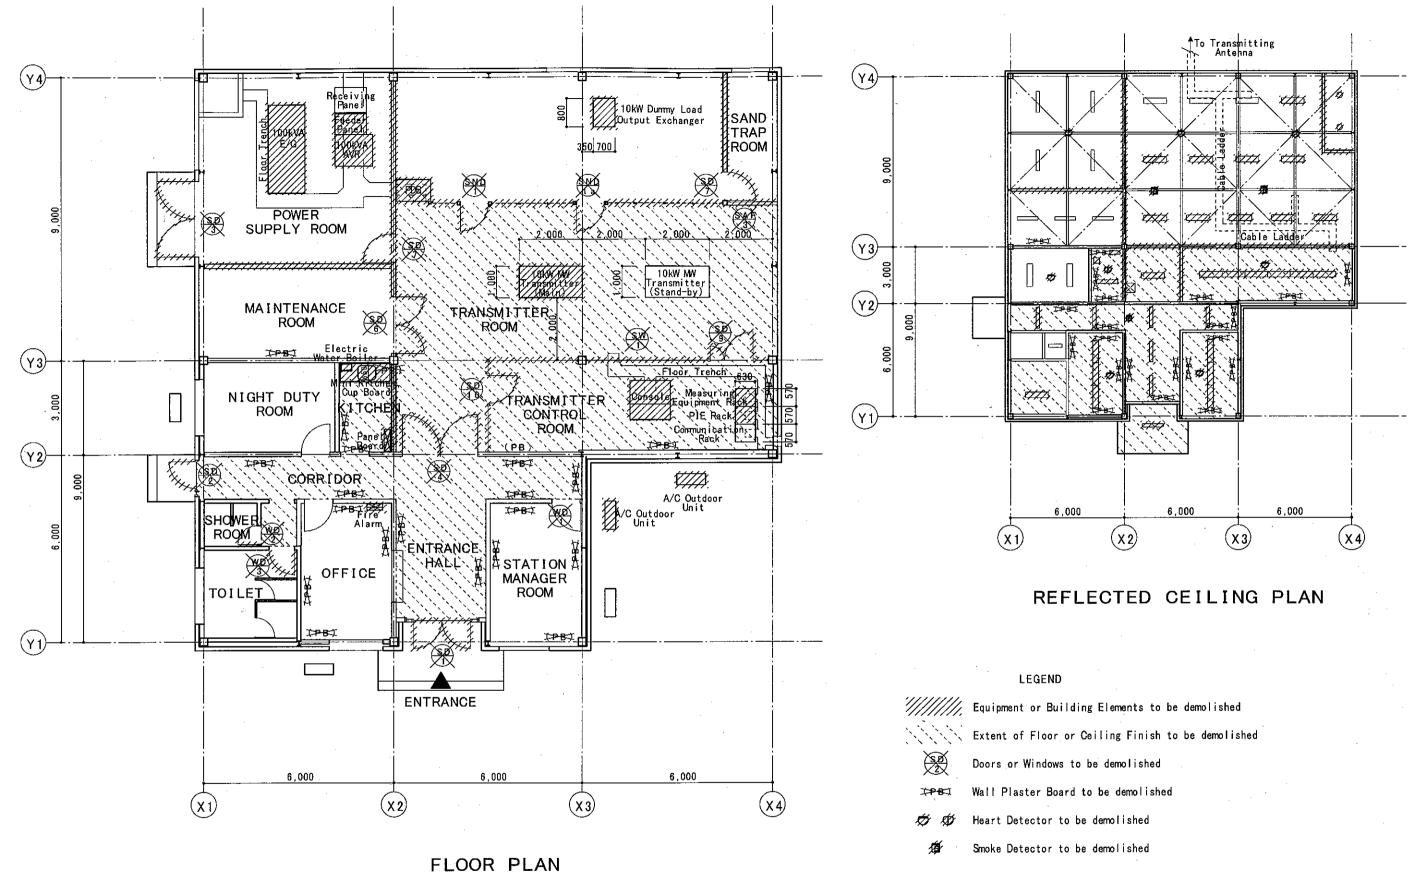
BARDIBAS 10kW MW TRANSMITTING STATION DEMOLITION PLAN
